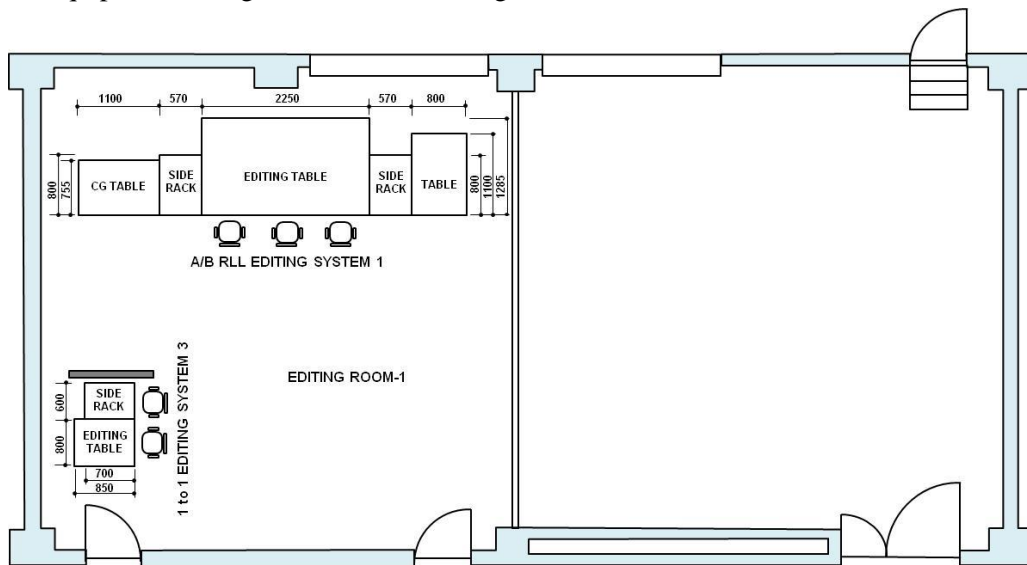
Equipment Arrangement of Editing Room-1
